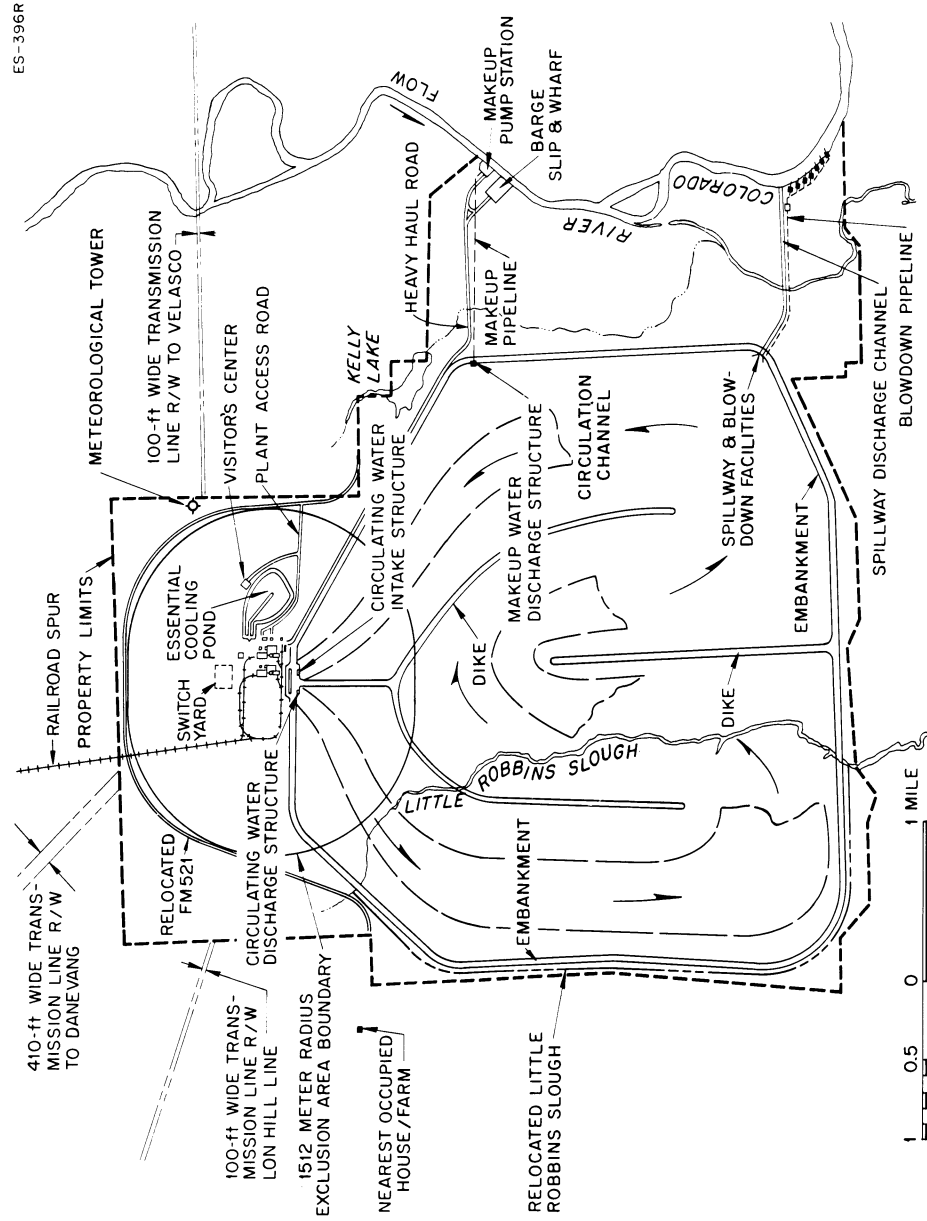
Site development plan. Source: PSAR, Fig. 2.1-4.
